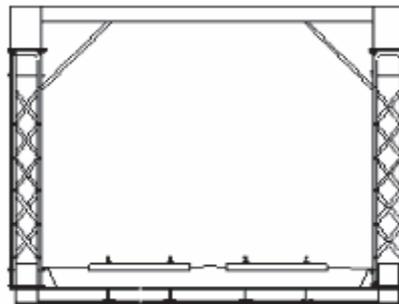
Through truss bridge, with cross girder, floor plate, railbearers and ballast.
